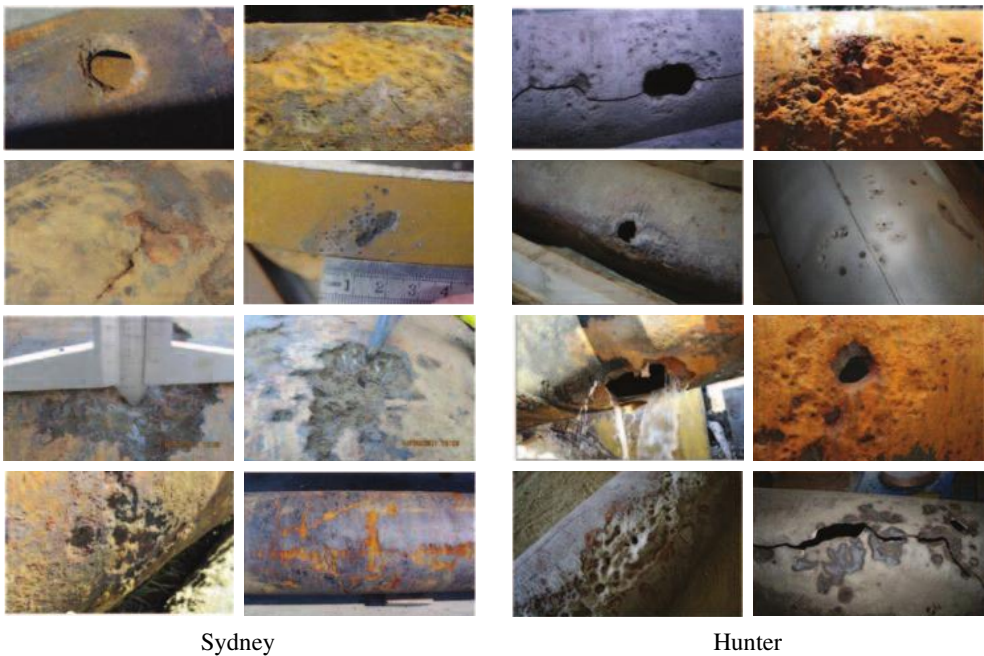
Pitting corrosion patterns that have generated host pipe holes. Adapted from [56].
